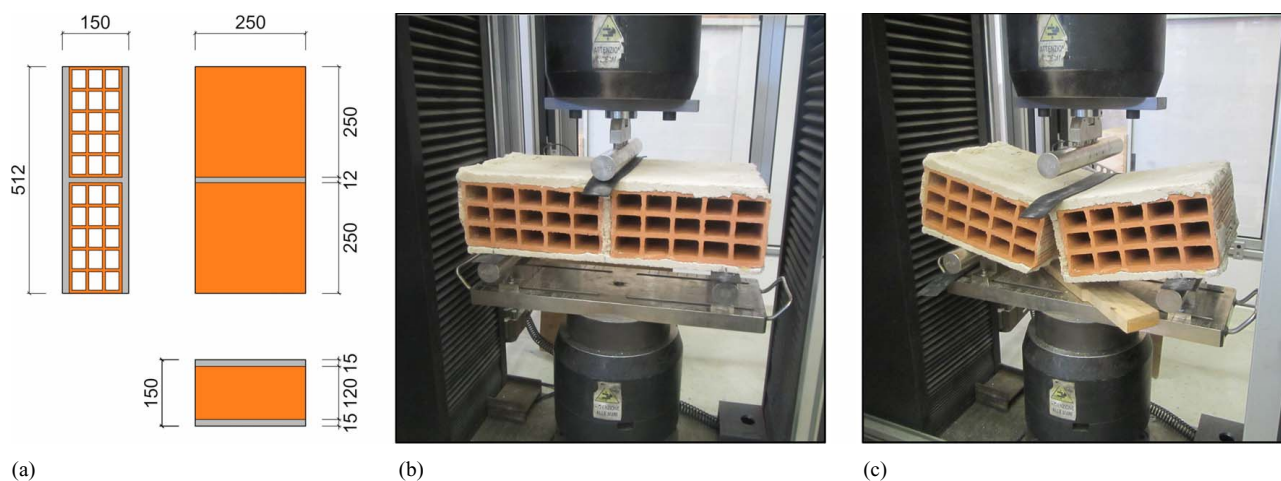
Flexural tests on mortar joints: (a) geometry with dimensions in mm; (b) test setup; and (c) failure mode.
